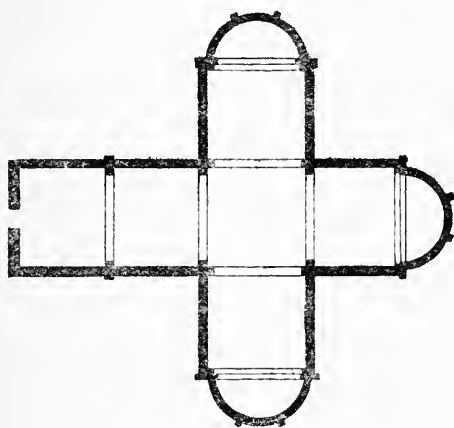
Plan of San Nazaro Grande, Milan, Greek Cross. (No scale.)
